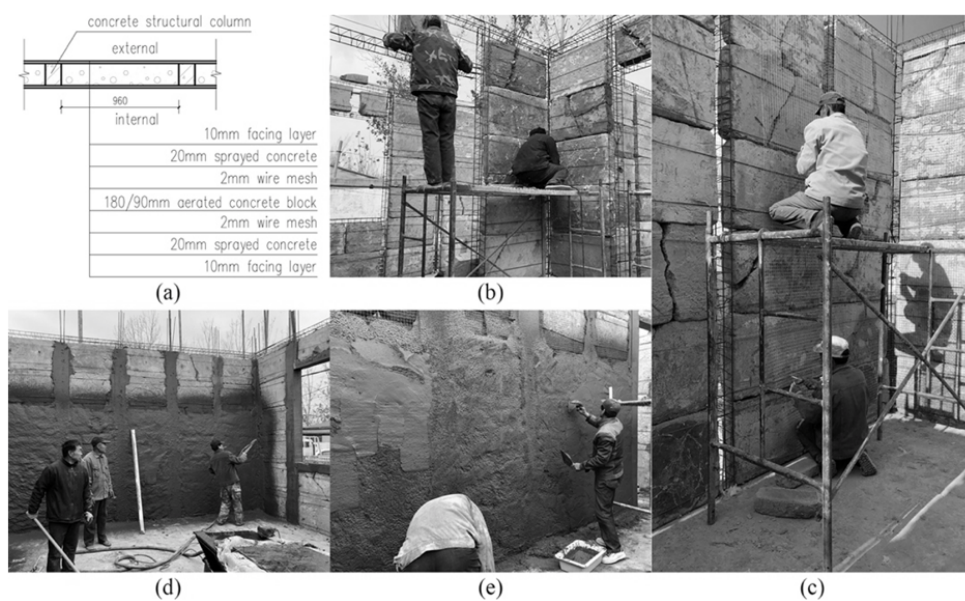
Construction detail (a), and the construction process (c-e) of the wall
